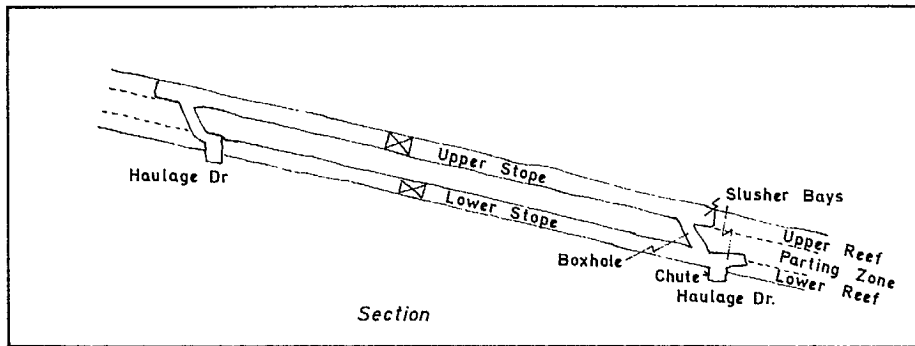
Typical stope and pillar layout for double-seam mining in the 1960's
